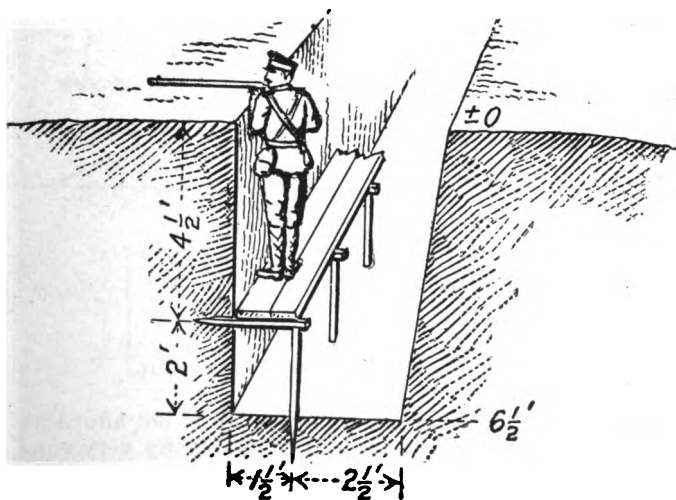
FIRING TRENCH WITHOUT PARAPET
